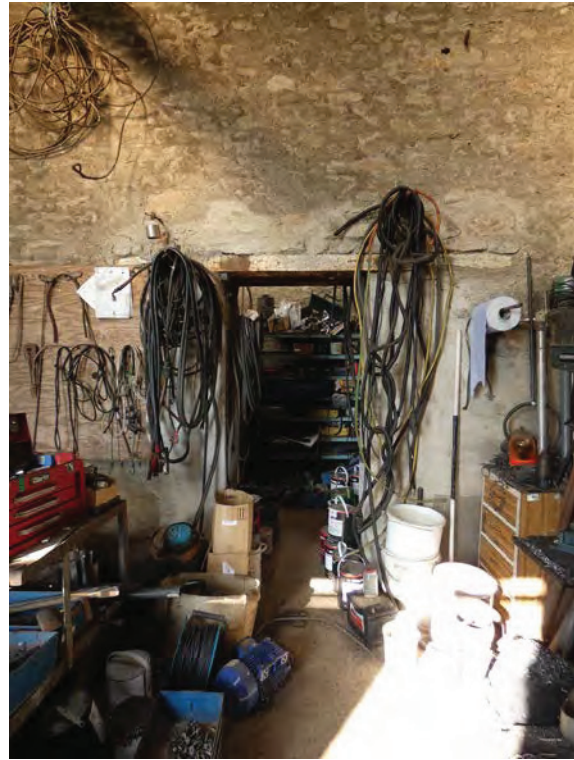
(right): Doorway in the north-west elevation of Room G1, viewed from the south-east
